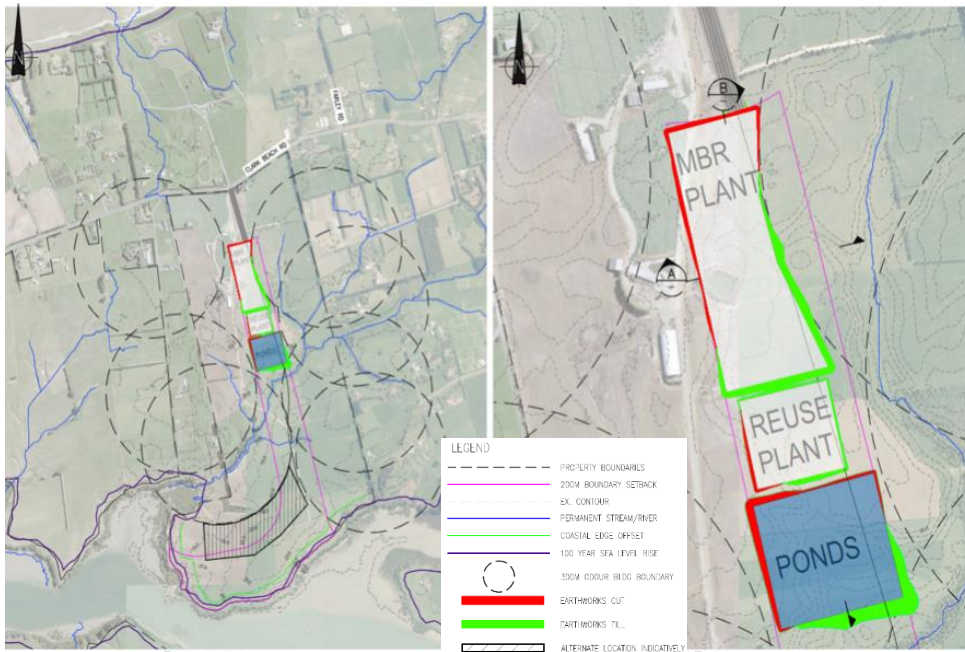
Site C indicative site layout (refer to Appendix D for more detailed plans). Hashed area shows possible alternative WWTP location, dashed circles show 300m from existing residential dwelling.
